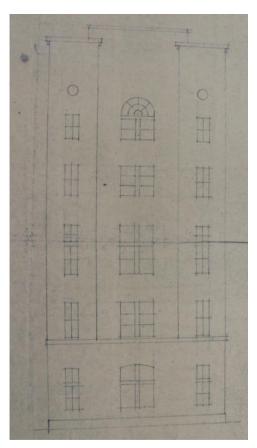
Elevation drawings showing windows of Irving Street Brewery buildings: East façade of building 22 by the Department of Building Materials, Drawing No. M24708 dated 28-04-50
